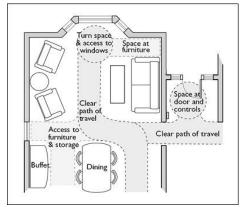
Accessibility Example in Floor Plan (Imrie 2003)
